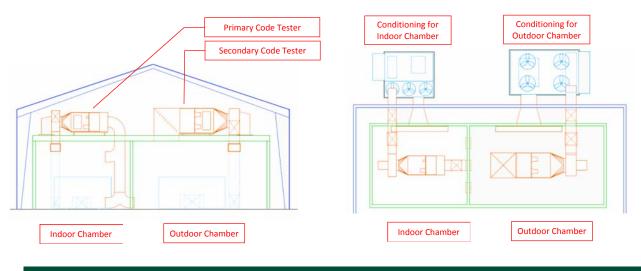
LABORATORY LAYOUT – SECTION VIEW
